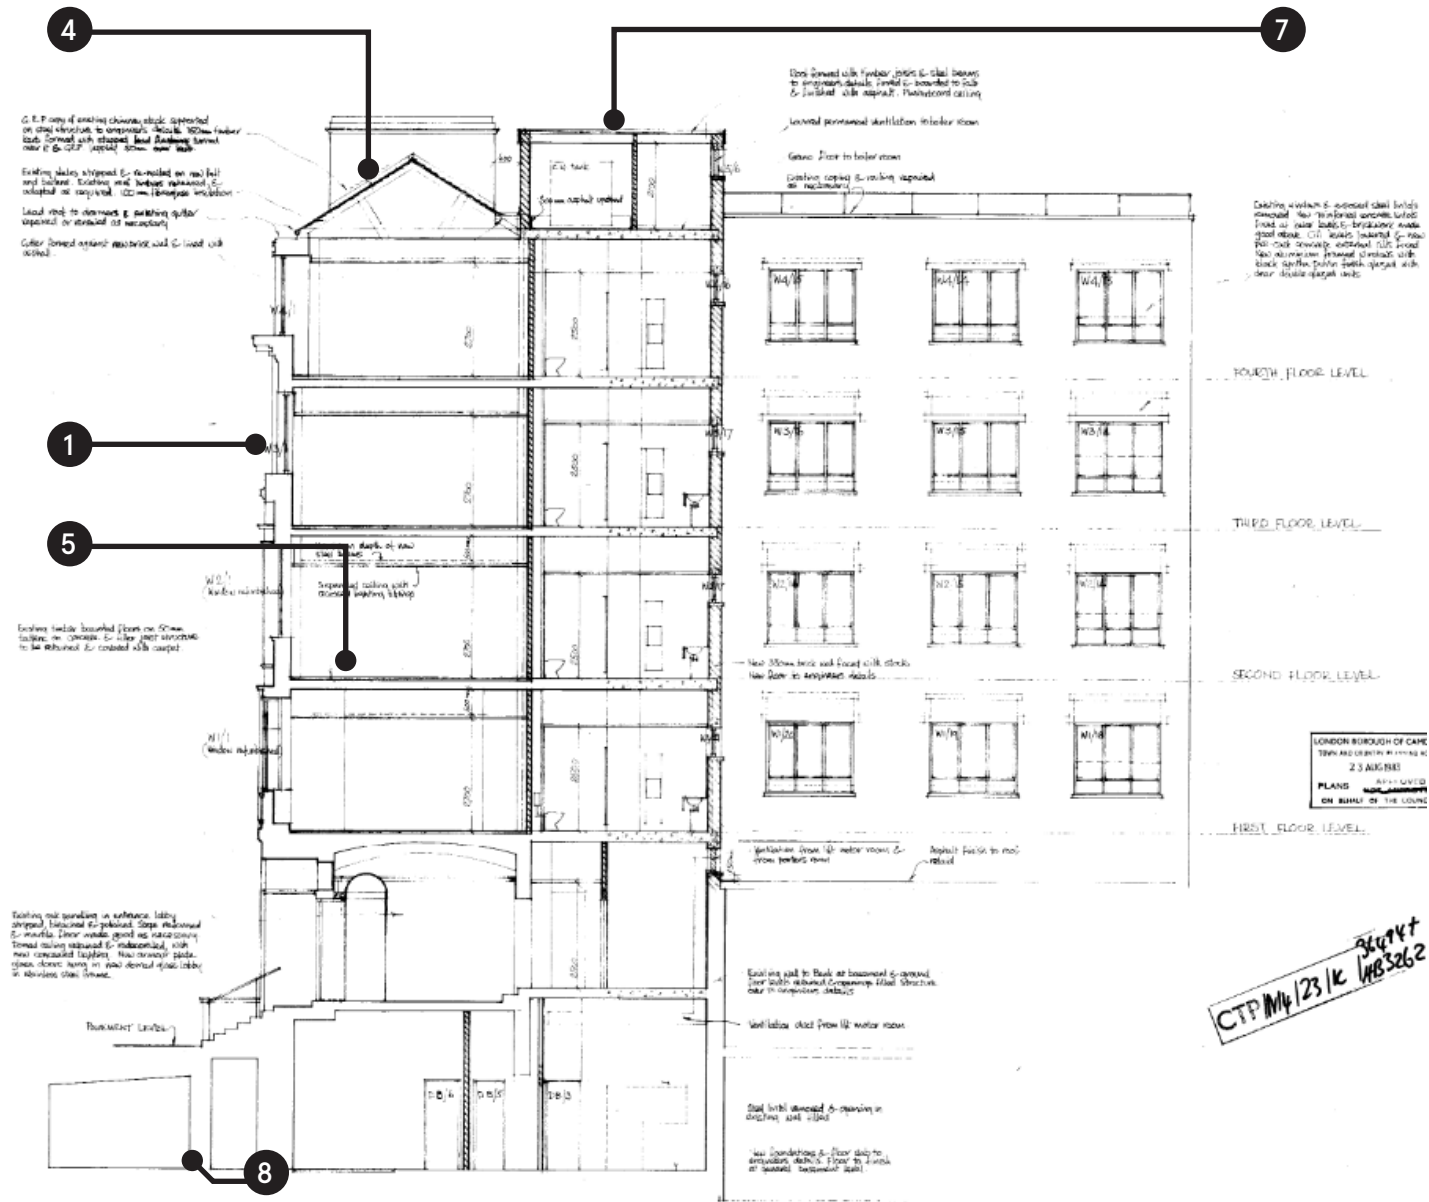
ARCHIVE SECTION THROUGH EXISTING STRUCTURE, 1983
